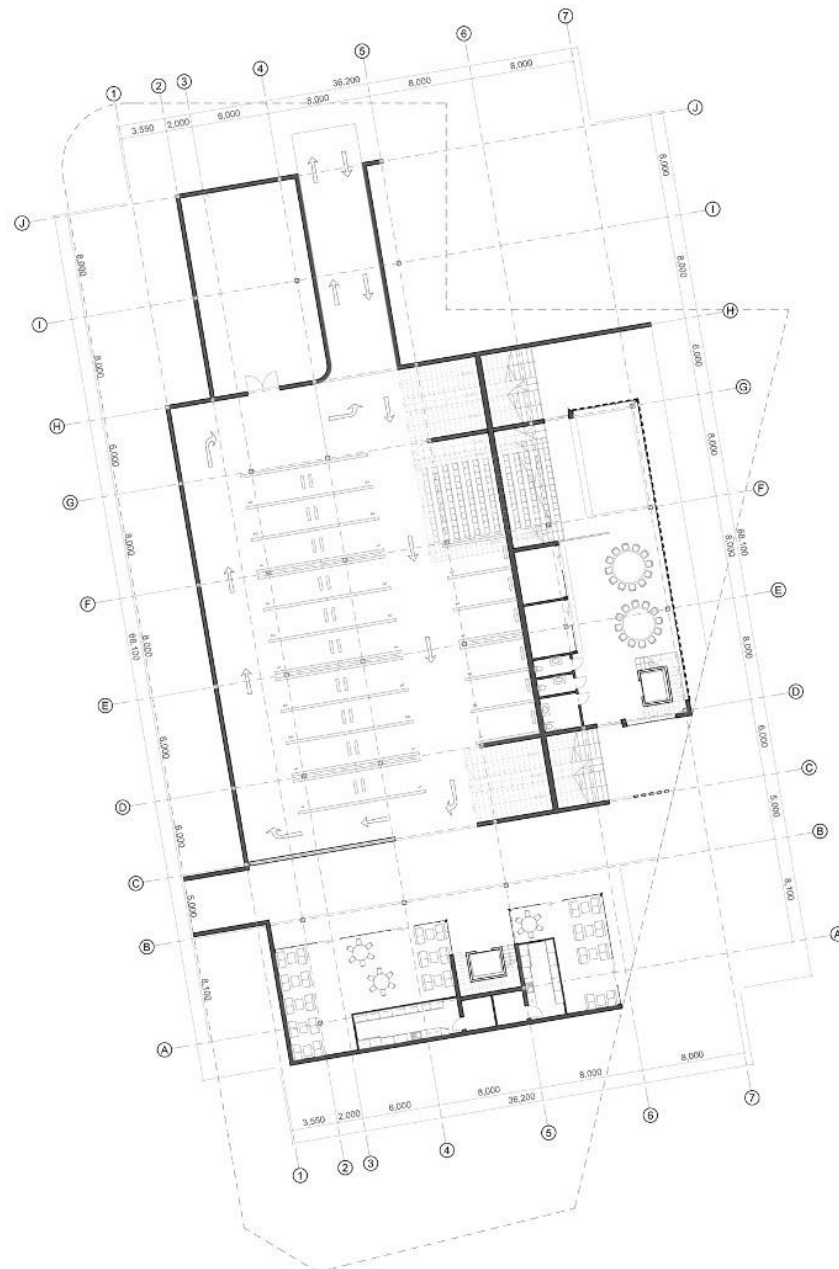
Underground floor plan of the multifunctional public library (not in scale) by the author.
